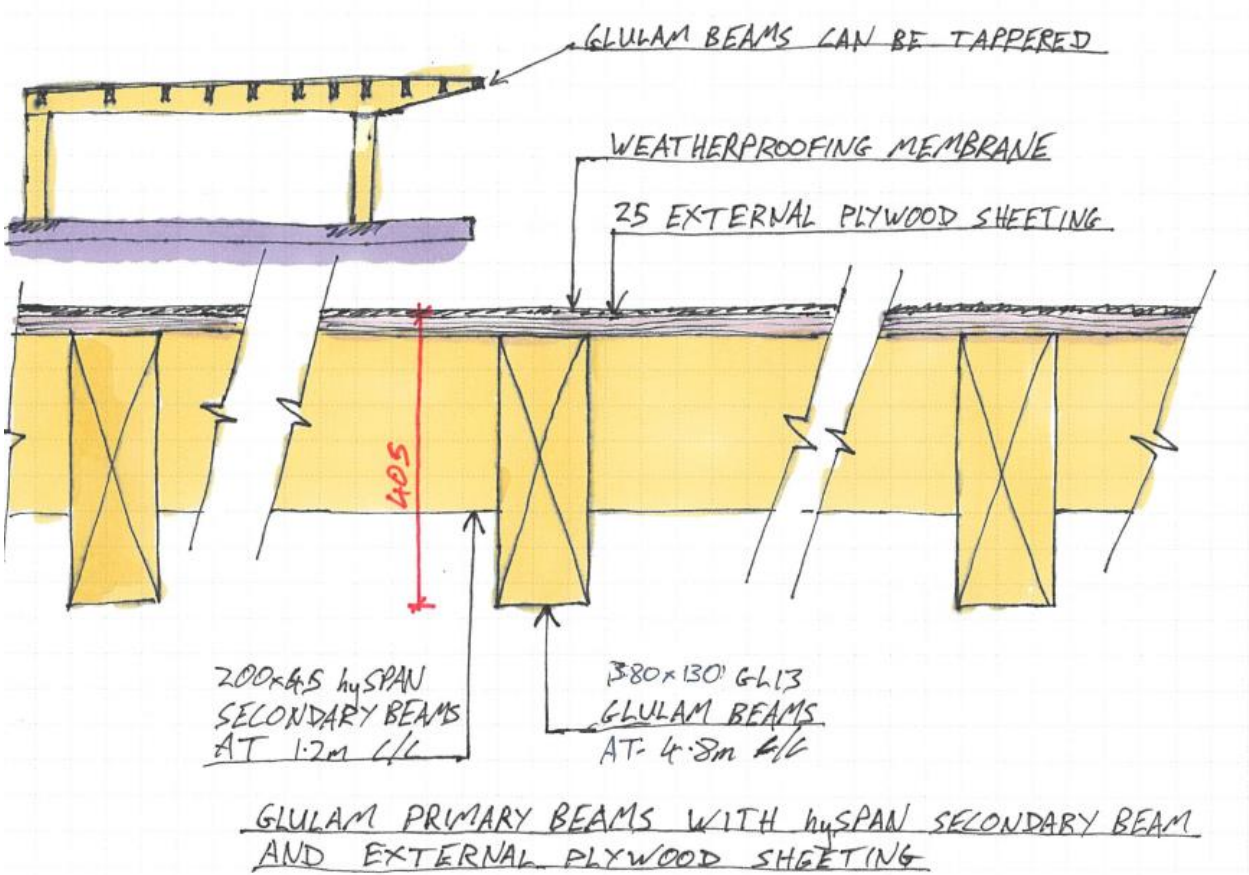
Option 1 - Glulam beams with hySpan Secondary Beams
